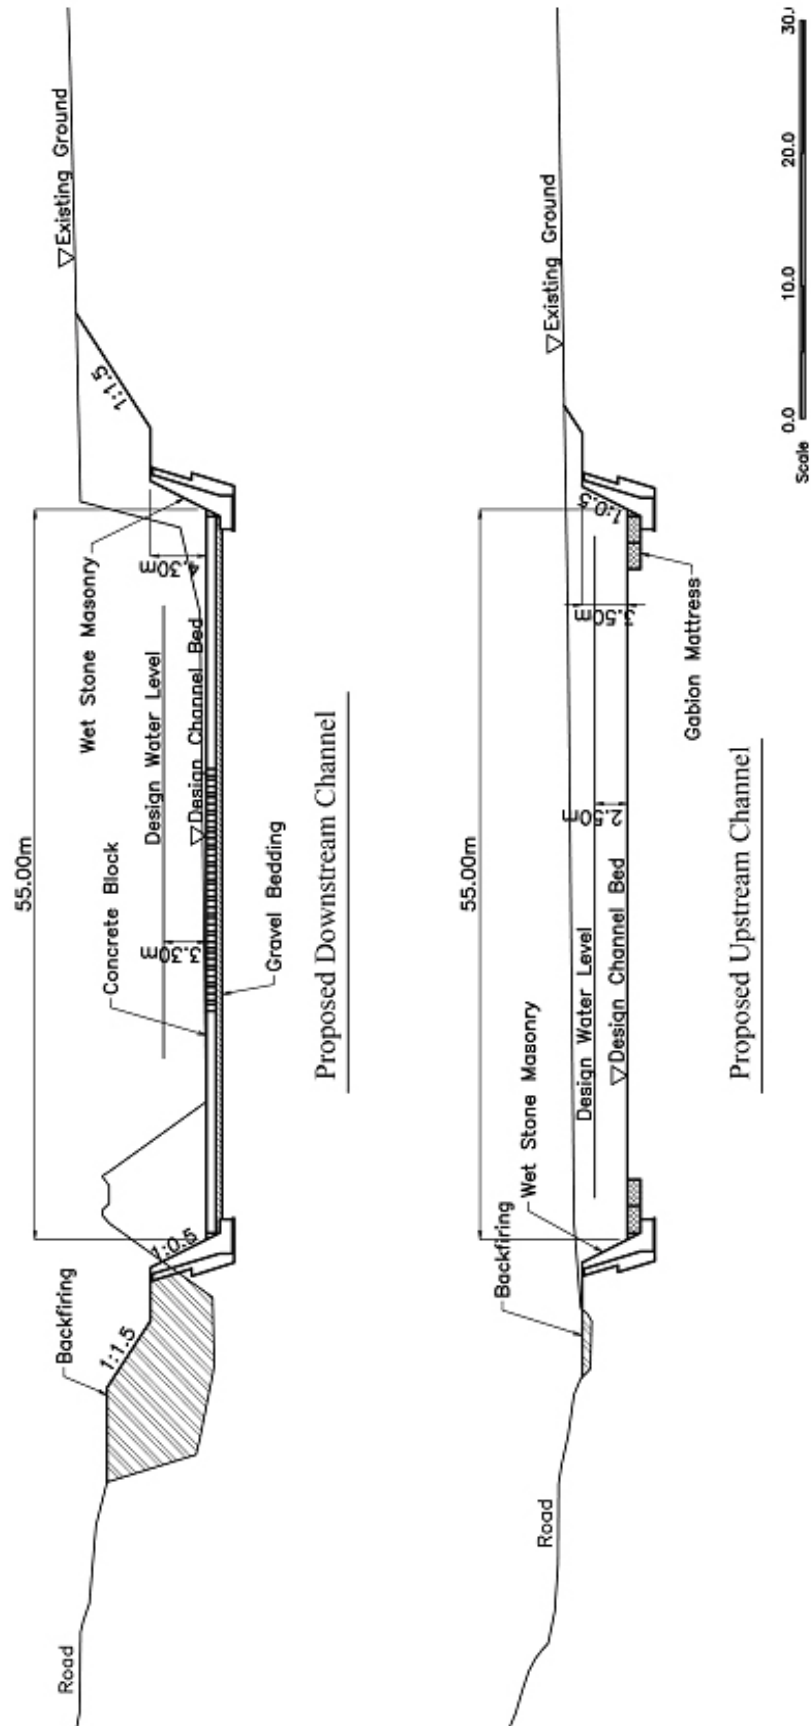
Typical Cross Section of Proposed Channel Works
